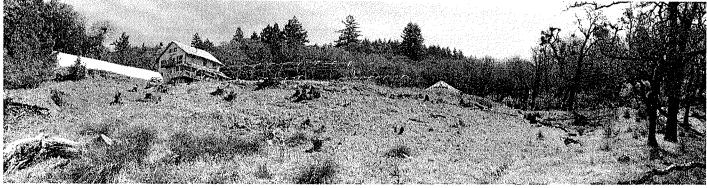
Site A – Looking east from west edge. Crossing at RP 1 in Photo right.
